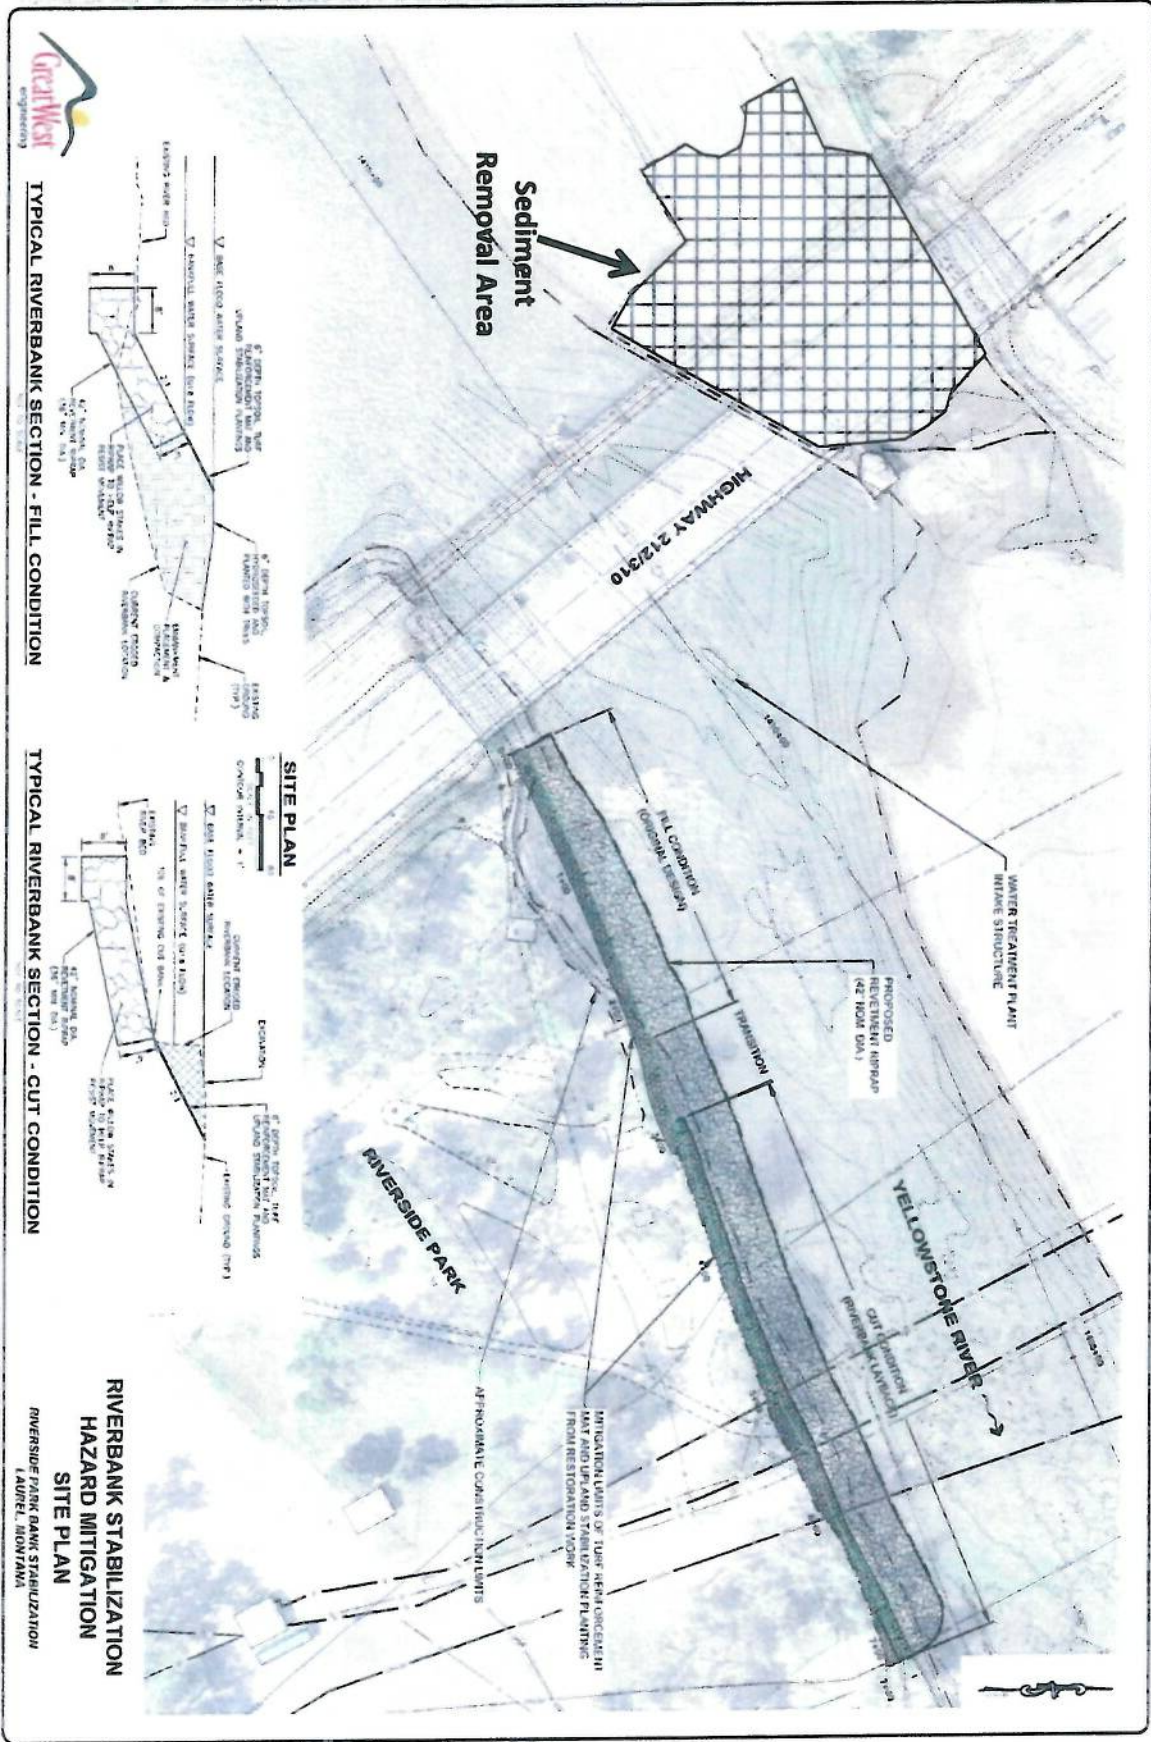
Exhibit C – Bank Stabilization Plan with Sediment Removal Area
